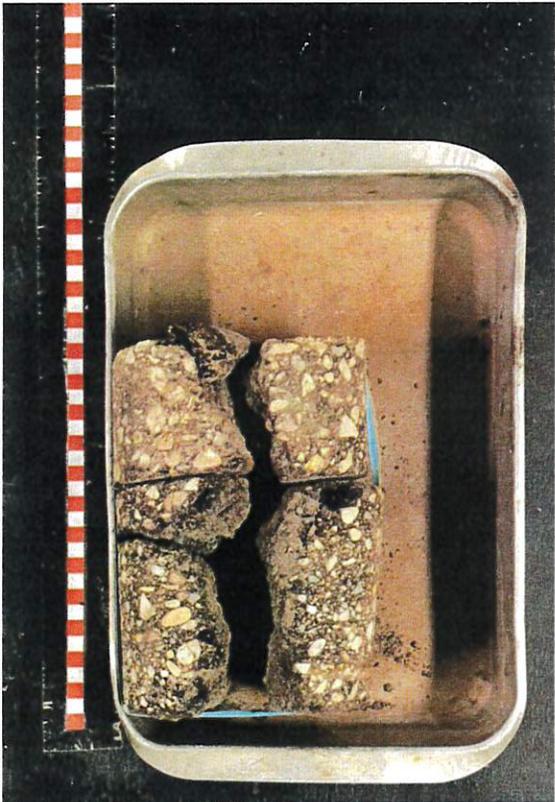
Specimen from Plessis Road, Northbound Lane
